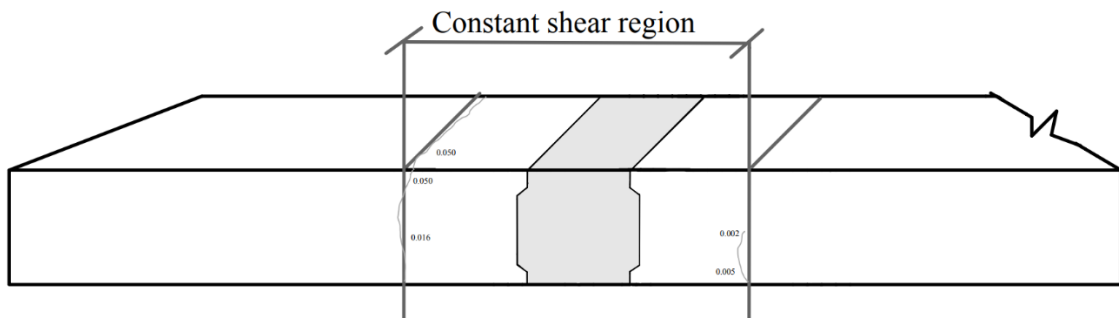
Crack Propagation for Proprietary Short-Term Specimen at 60 % of Final Load
